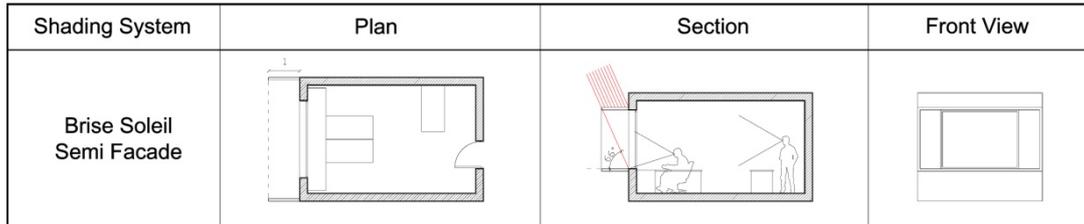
Plan, section and Front view of Brise Soleil Semi Facade shading System
